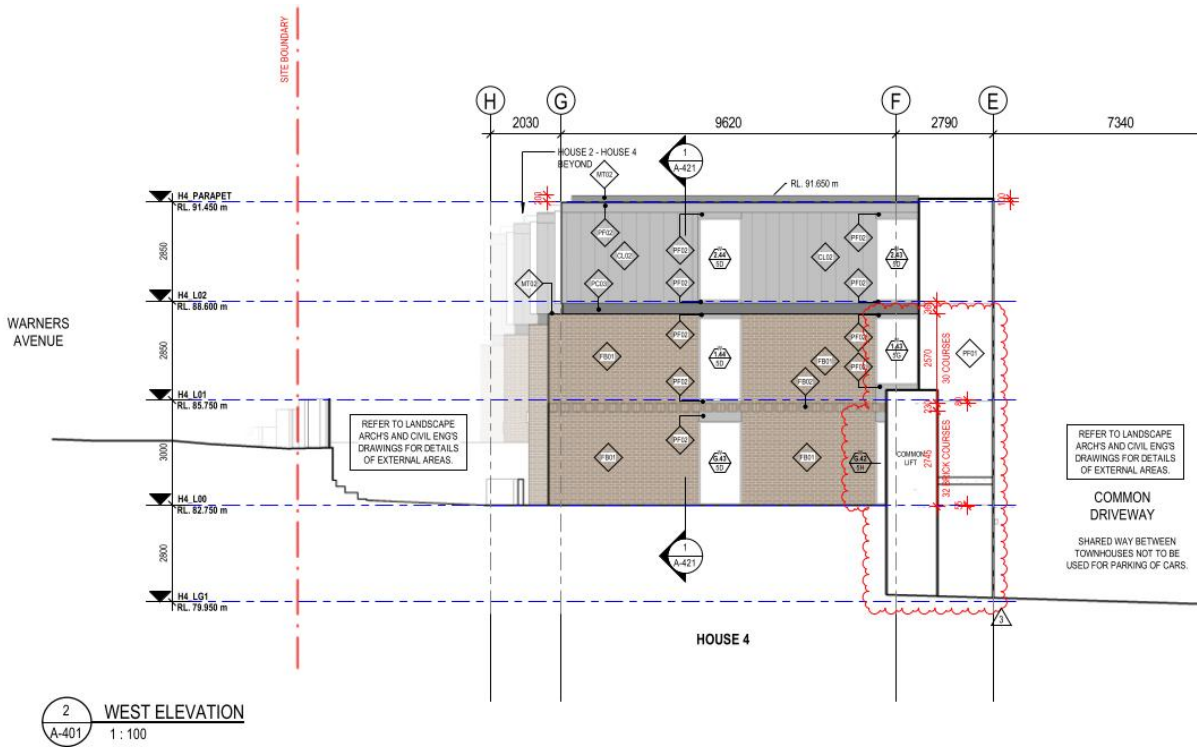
Proposed western elevation showing lift location and glazing amendments.
